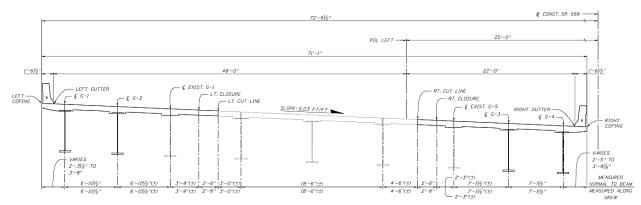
Cross-section of the SR-589 Bridge over Hillsborough Avenue
